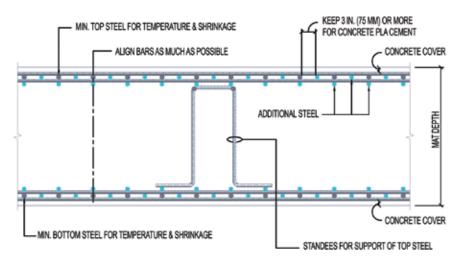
Typical configuration of reinforcement in a deep mat foundation
